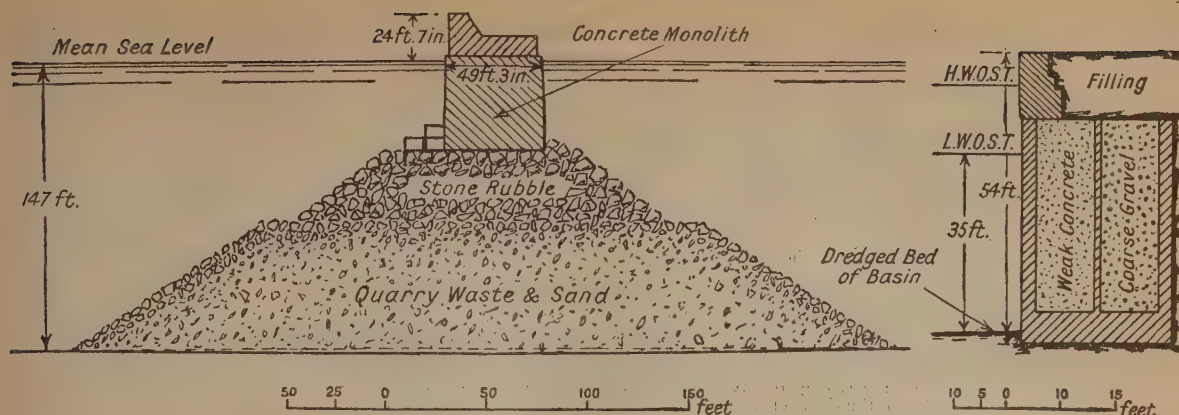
Valparaiso Breakwater. FIG. 2.—Dublin Quay Wall. Floated Monolith of reinforced concrete.
